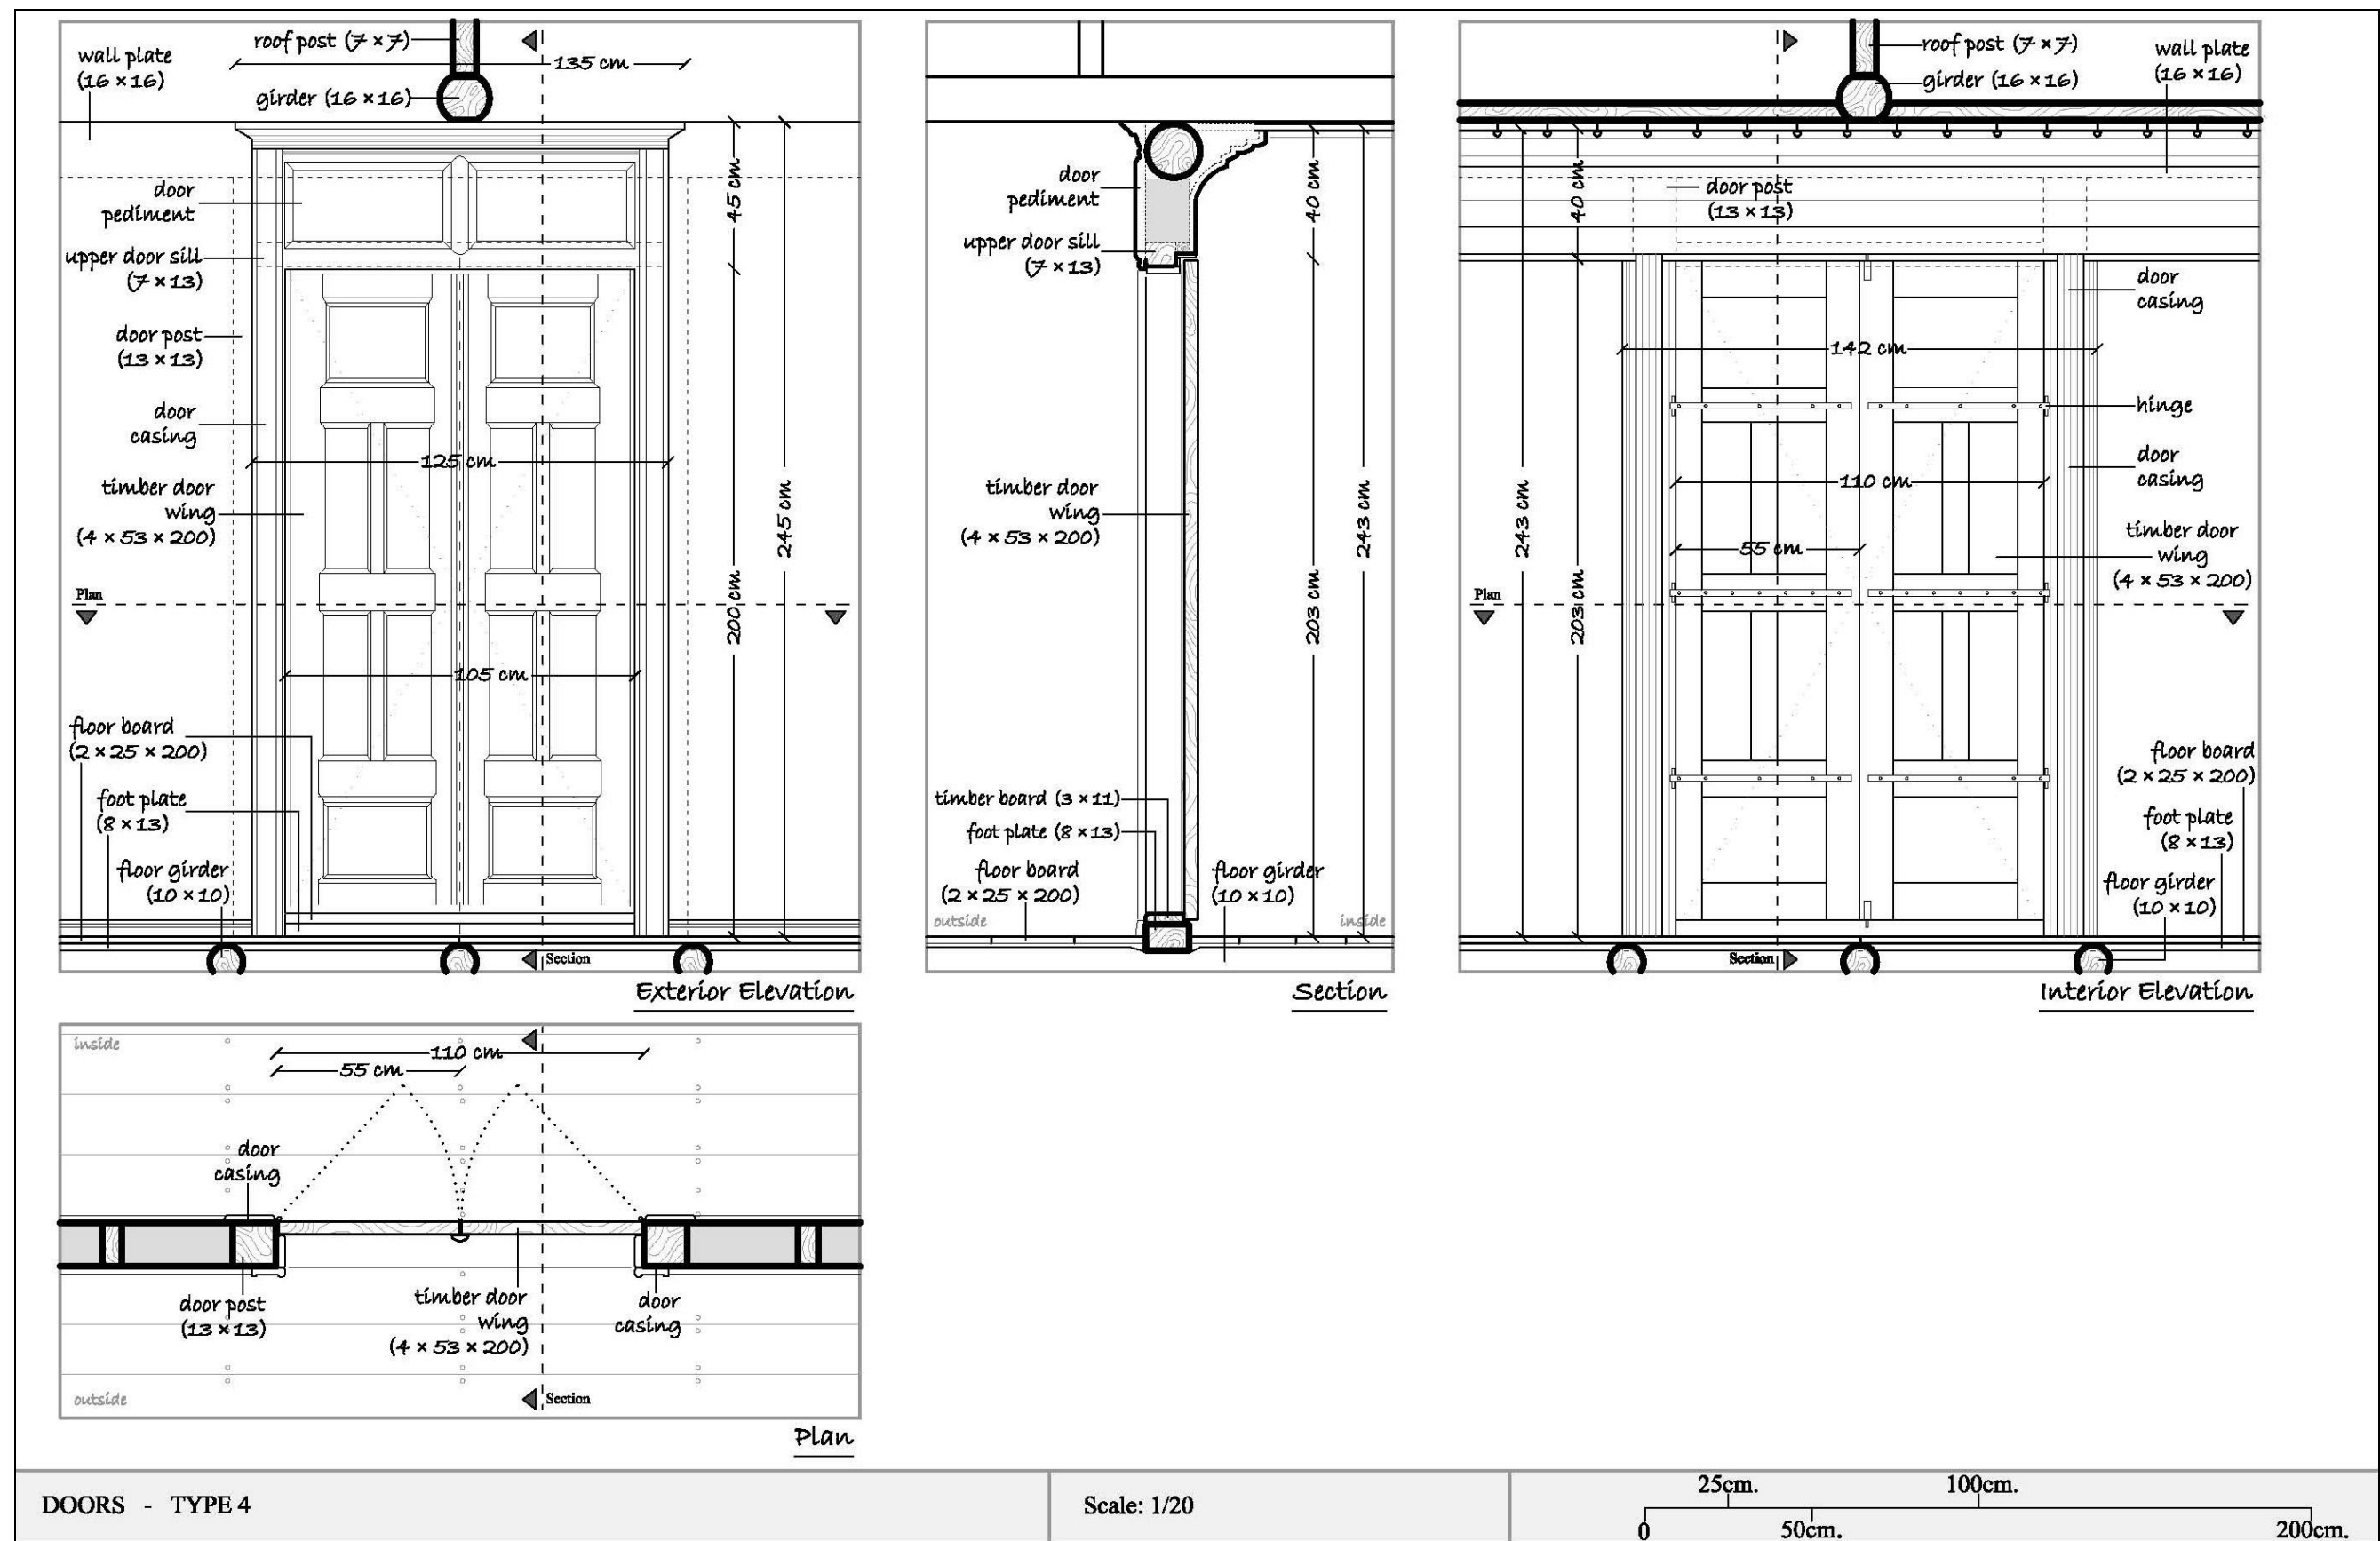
, Door openings Type 4 (Camikebir Quarter 3. Beyzade Street No:15)
